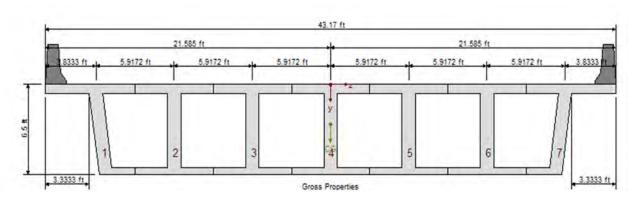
Flyover Ramps: EN, SE, WN - Typical Section
